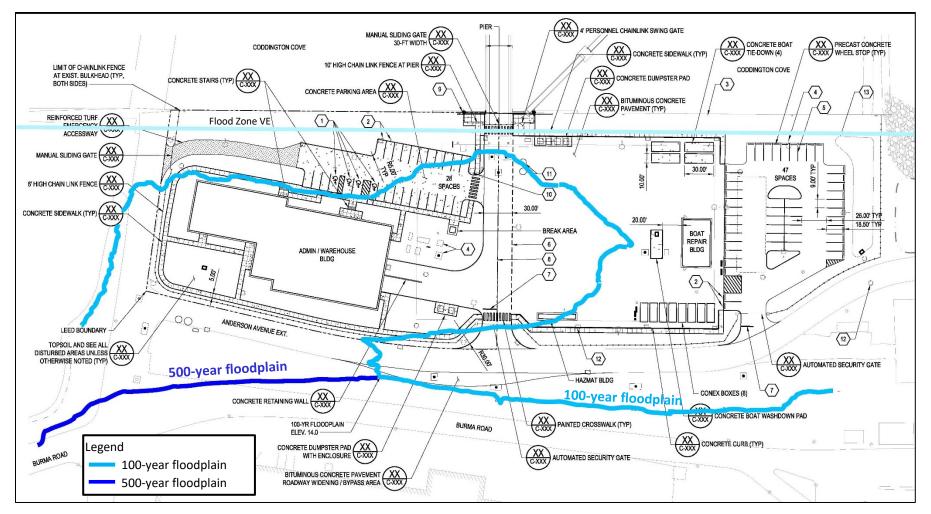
Shoreside Support Facilities at Pier Landing Site (Proposed Action)
